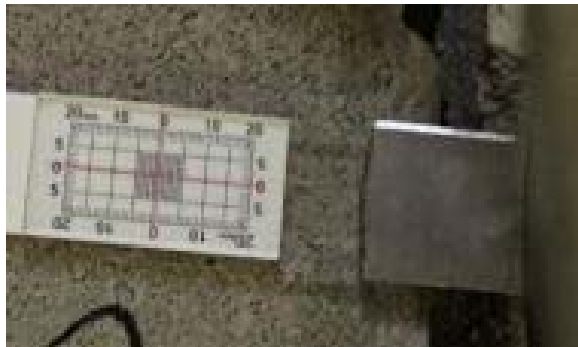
A. Crack Gauge 2 - Area F near NW corner of Electrical Room F116.
